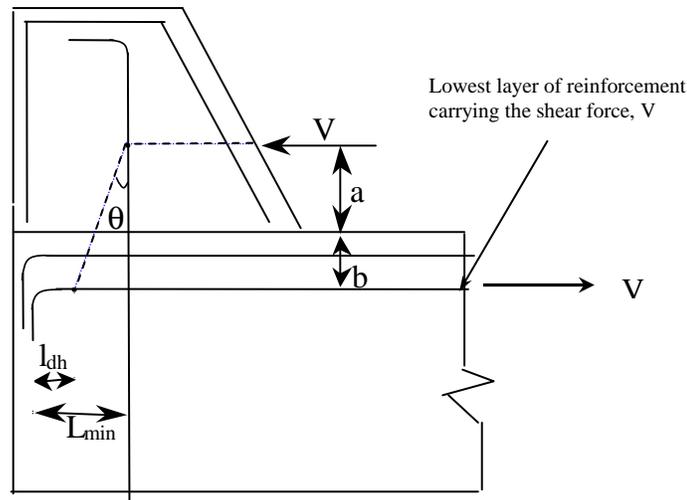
Schematic of Reinforcement Configuration with Hanger Bars
